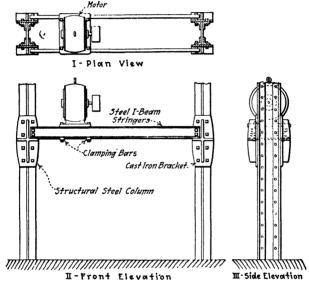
A motor support made of I-beam stringers provided with cast-iron brackets.
